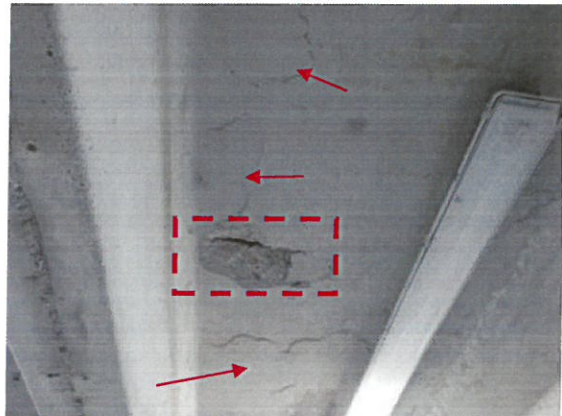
Concrete spalls (red rectangle) and delaminations (arrows) on underside of slab
